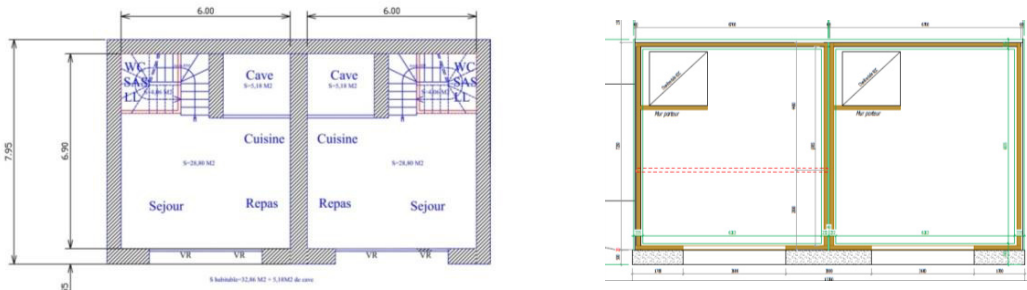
Architectural plans of the studied building. Left: Ground-Floor: walls and vaults made by puddingstone concrete. Right: First Floor: wooden walls, excepting the façade.
